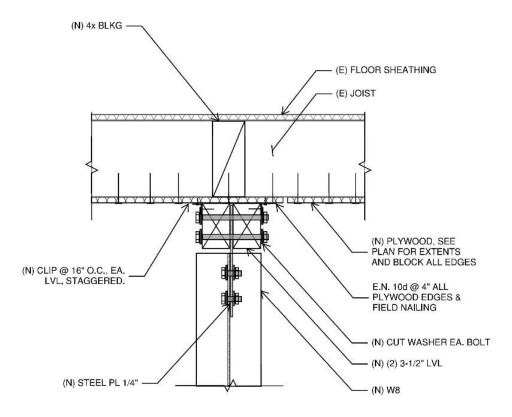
Load path connection from top of steel cantilever column to LVL collector.
